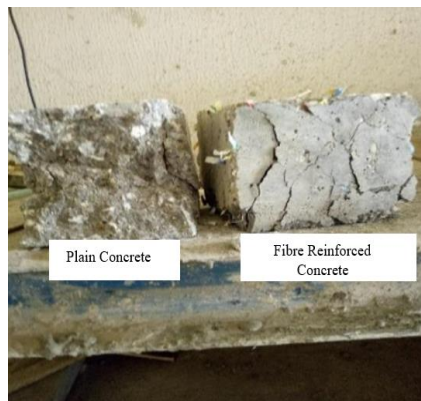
Comparison of failure modes of concrete specimens with (fibre reinforced concrete) and without WMPF fibre (plain concrete) after subjected to compressive load
